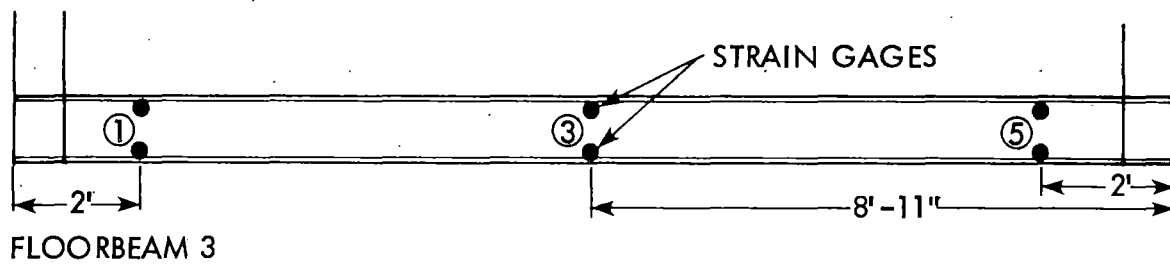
Location of strain gages on floorbeams in Span 1 - Hubby Bridge.
